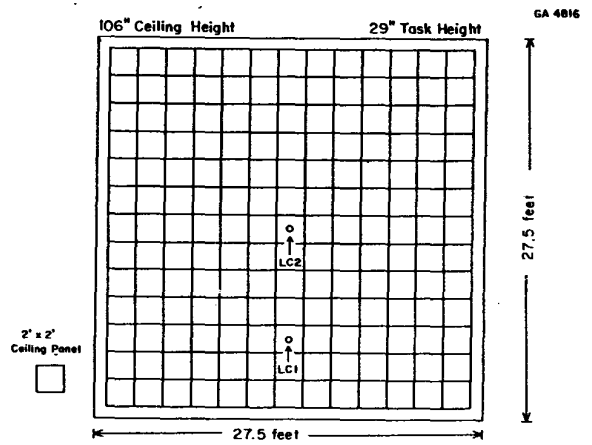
Lighting layout for translucent ceiling installation showing two test locations.
